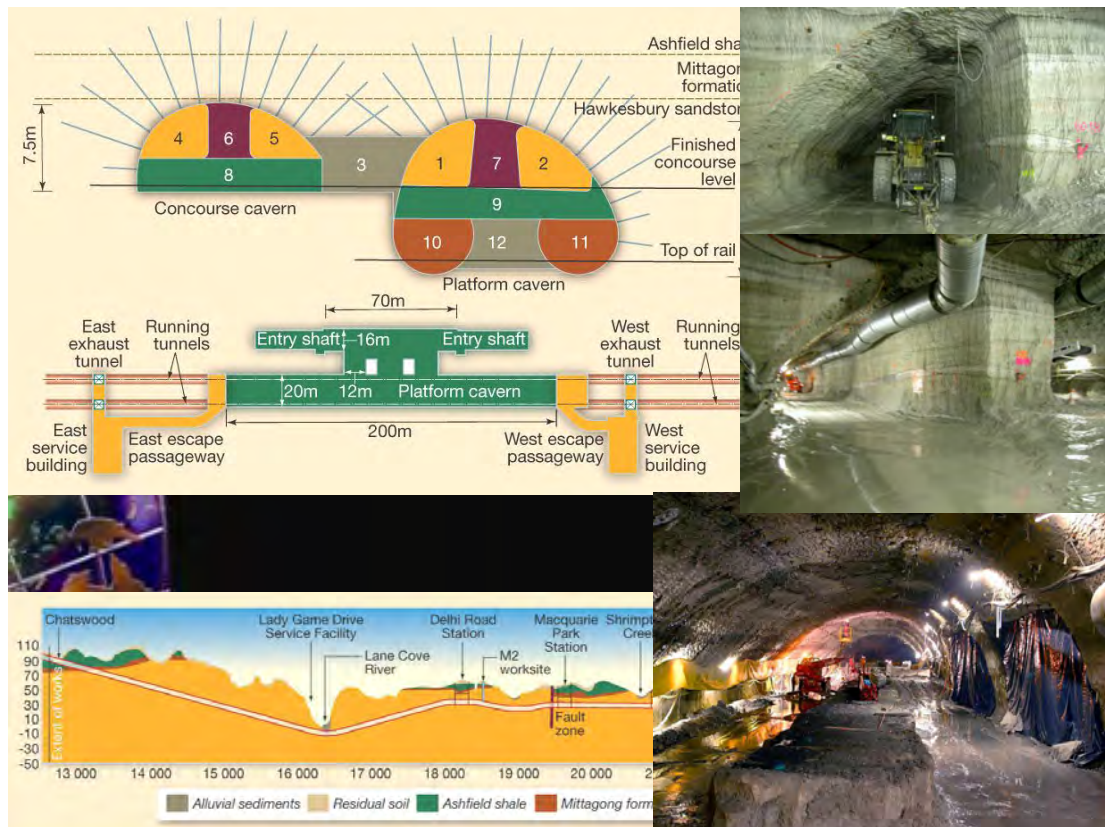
ECRL Macquarie Park Station outline details (Tunnels & Tunnelling Feb 2004)
